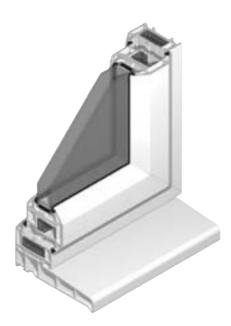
PVC-U window construction. (Source: BPF Windows Group.)
